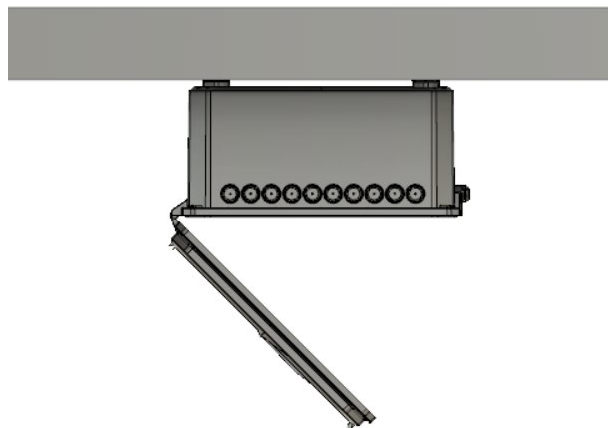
Upside-down installation of logger enclosures mounted to bottom of deck; to prevent water damage to housed equipment, all cord grip holes need to be as close to lid as possible
